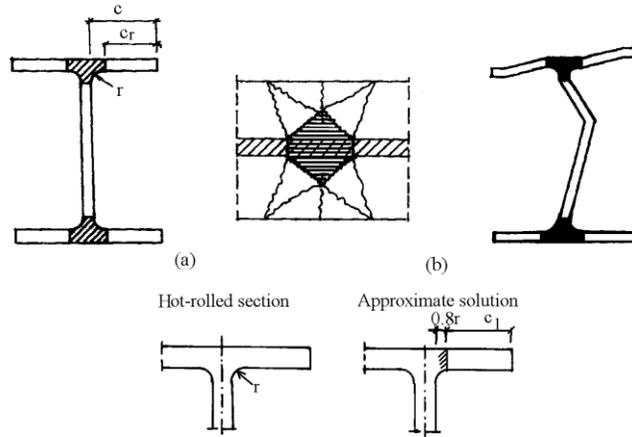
Plastic collapse mechanism for hot-rolled sections
